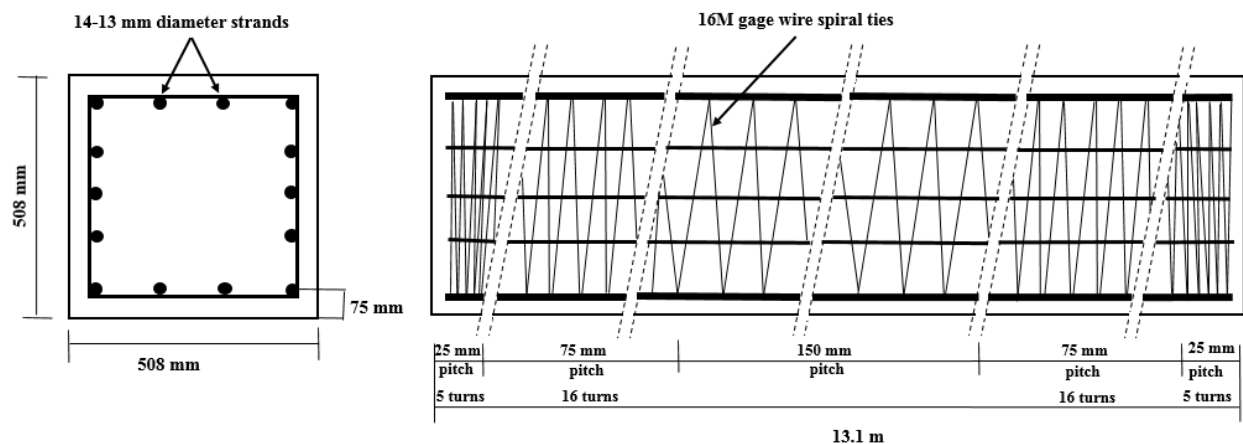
Details of prestressed concrete pile used in VDOT (Pando et al. 2006) (1 mm = 0.039 in, 1 m = 3.28 ft)
